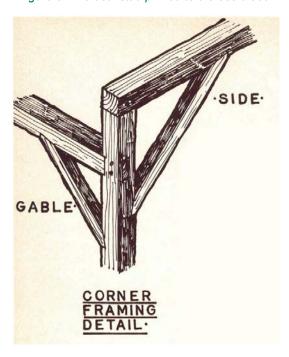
Possible framing technique used at Bowes House, where the posts of the 'bent' are load bearing and the plates are either at the top of the kneewall ('side') or support the floor ('gable') (from Rempel 1967:108). Partitions and wall sections within this framing were formed from non-load bearing vertical studs and cross-braces.
